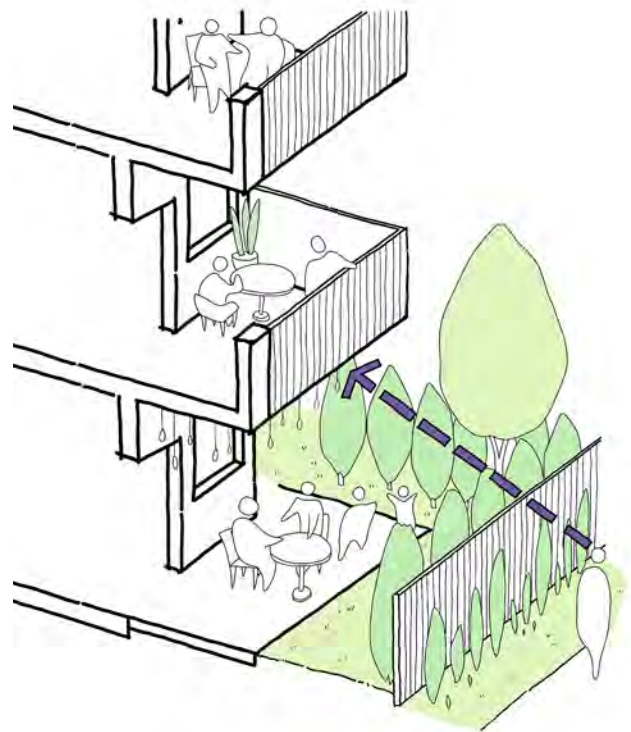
Fencing and layered planting provides privacy for interior living spaces and outdoor areas. Units may have direct access to the public sidewalk, but it's not required.
